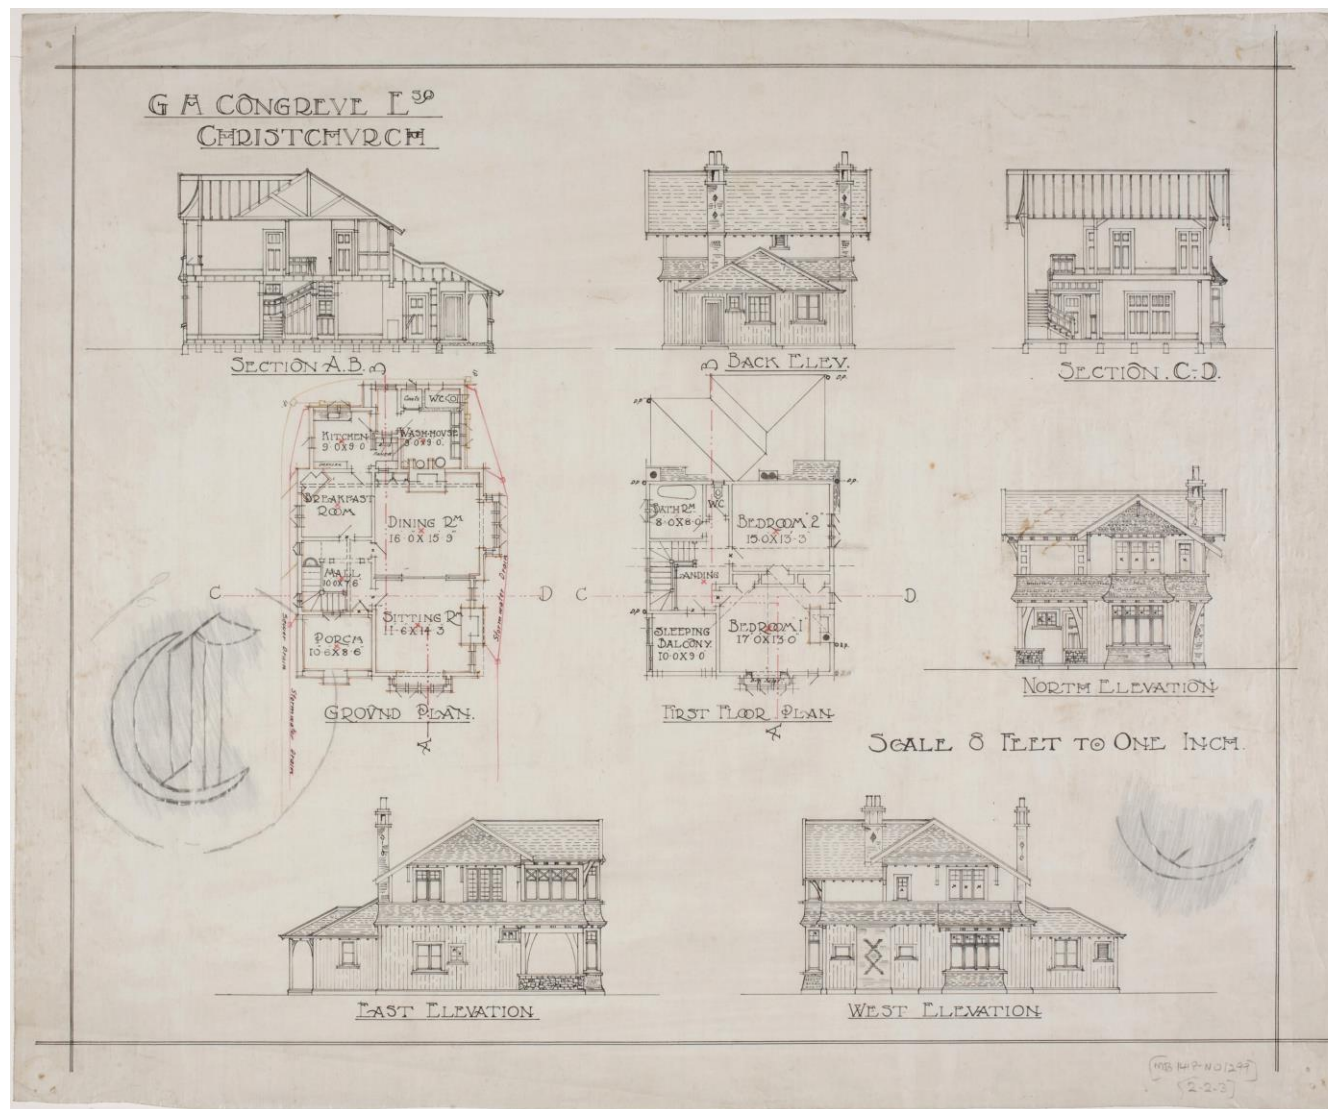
Collins and Harman, G. H. Congreve, plans, elevations and sections (1919).
